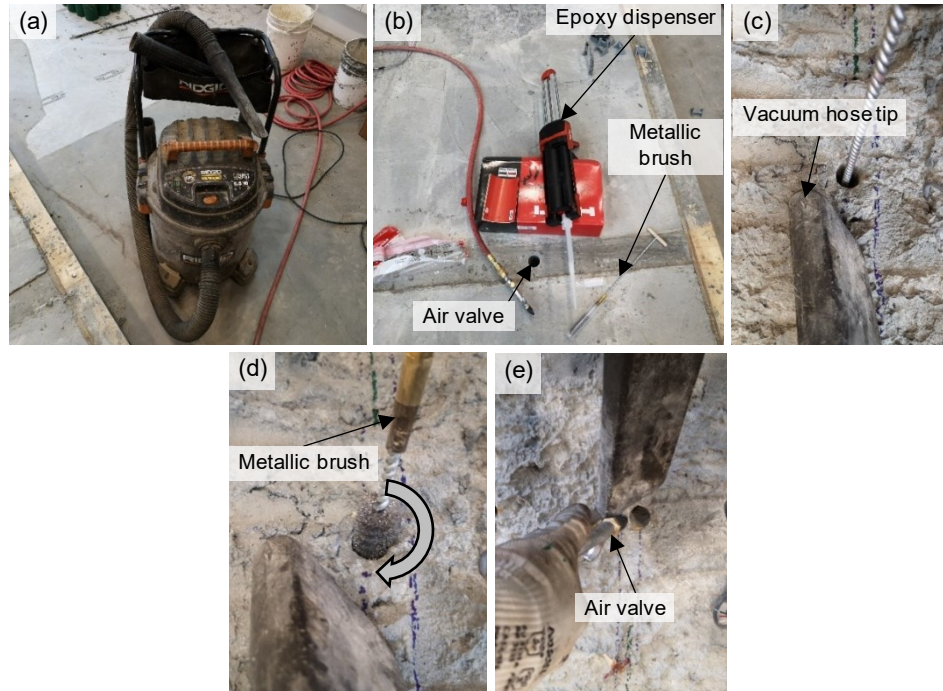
Tools used for hole preparation (a) Industrial vacuum, (b) Additional tools to clean holes from dust contained within, (c) metallic brush insertion, (d) metallic brush pullout in circular motion, and (e) compressed air pumped into hole. All steps had the vacuum hose tip nearby.
